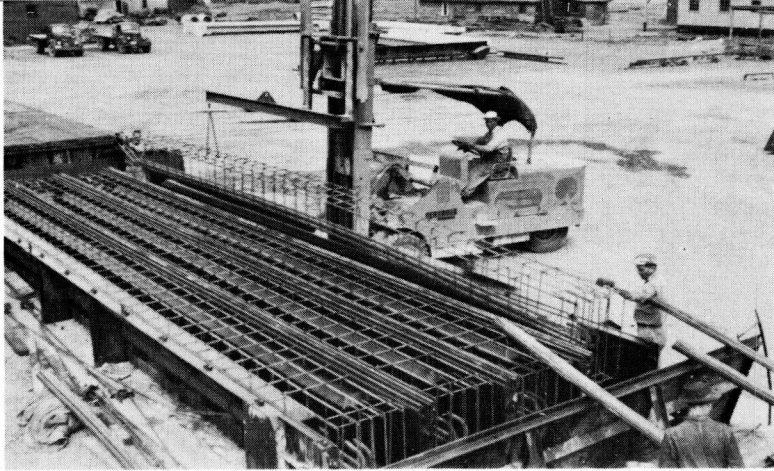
Snow-Sheds - State of Washington - Steel Forms for Battery of Five Precast Units - Reinforcing Being Placed - After forms are removed the battery of beams is covered with tarpaulin and the beams are steam-cured.
